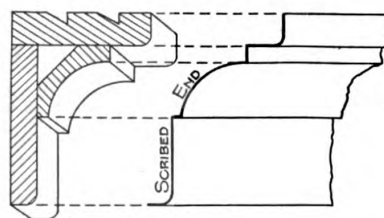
Section of a Plate Shelf or Rail with Scribed Right-Hand Return End
